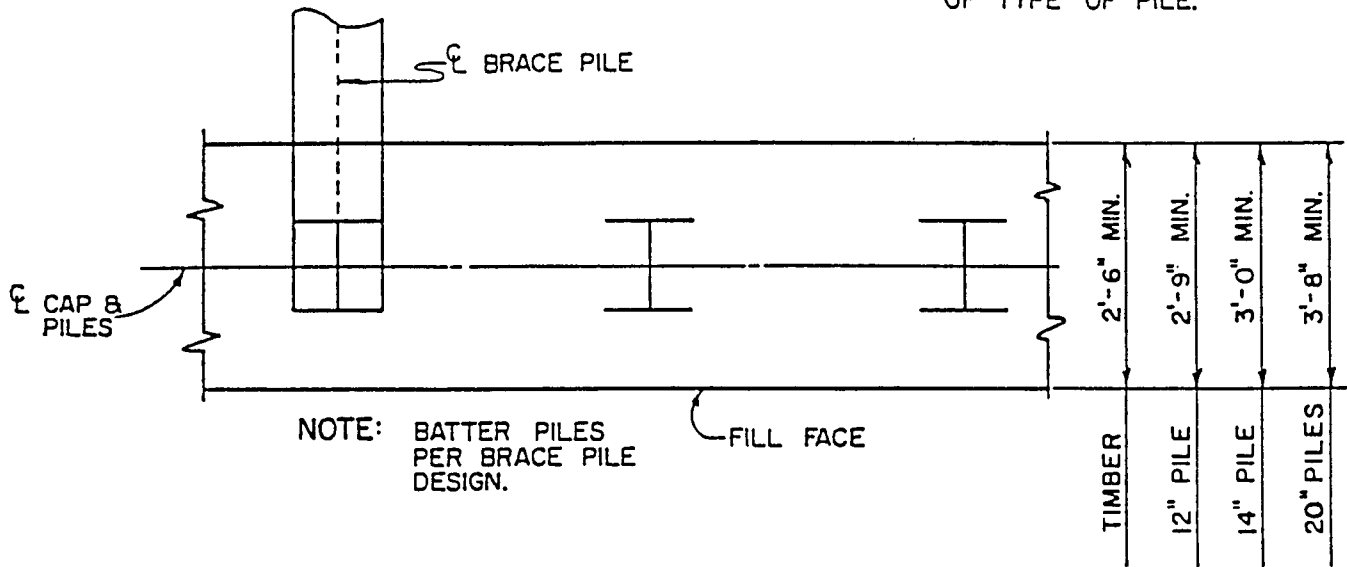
North Carolina Typical Single Row Pile Bent Details
